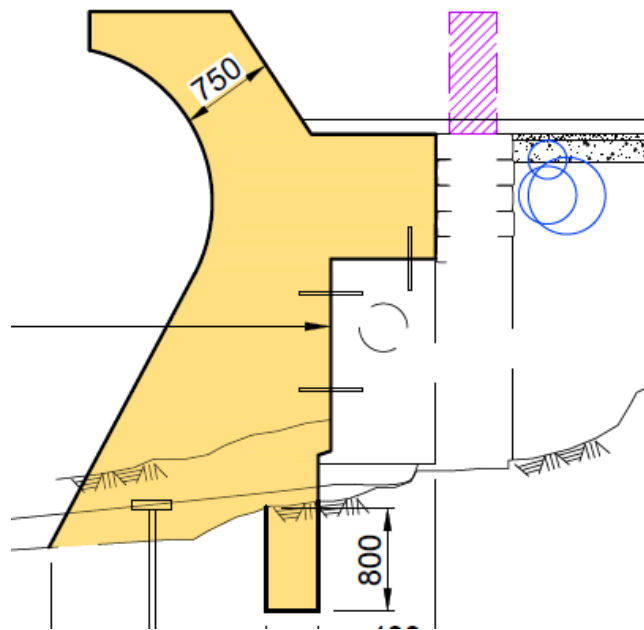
Example of wave return wall required to reduce wave overtopping to acceptable levels
